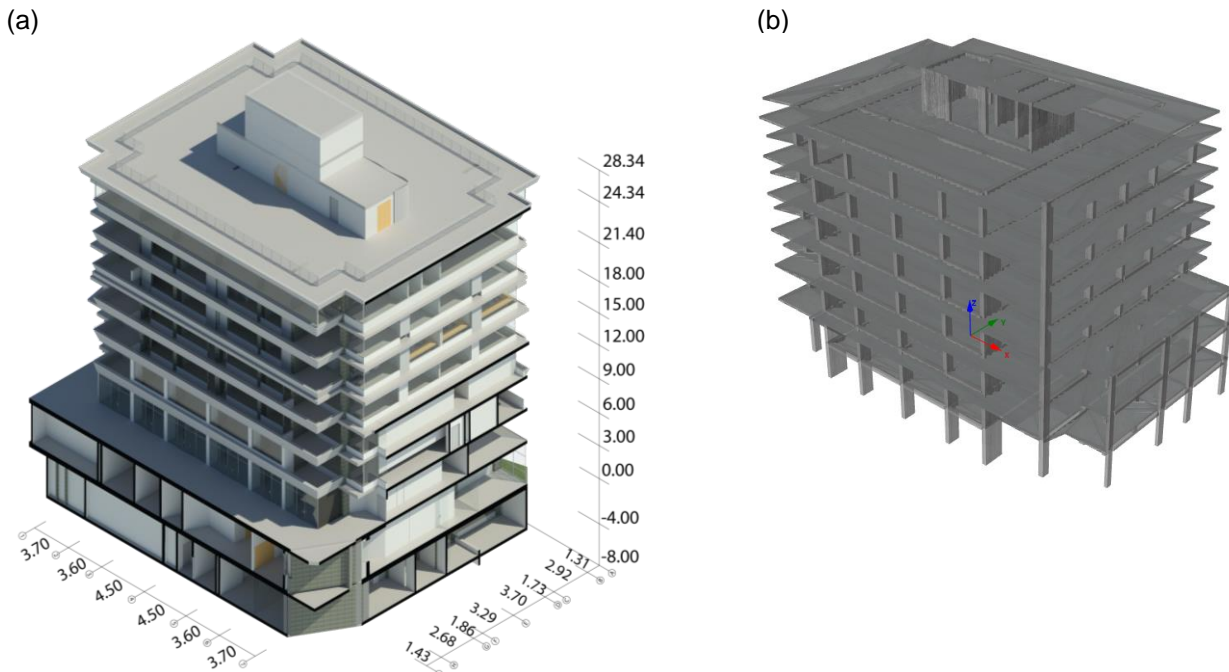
Illustration of the (a) architectural layout in meters and (b) structural modelling of the case study block
